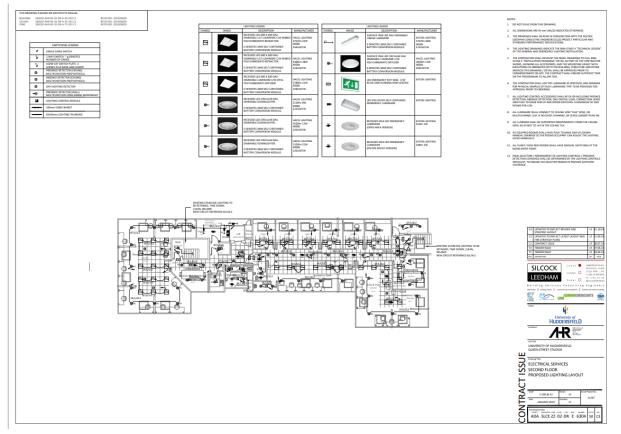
Electrical services Second Floor Proposed Light Layout (Percy Shaw House Building).
